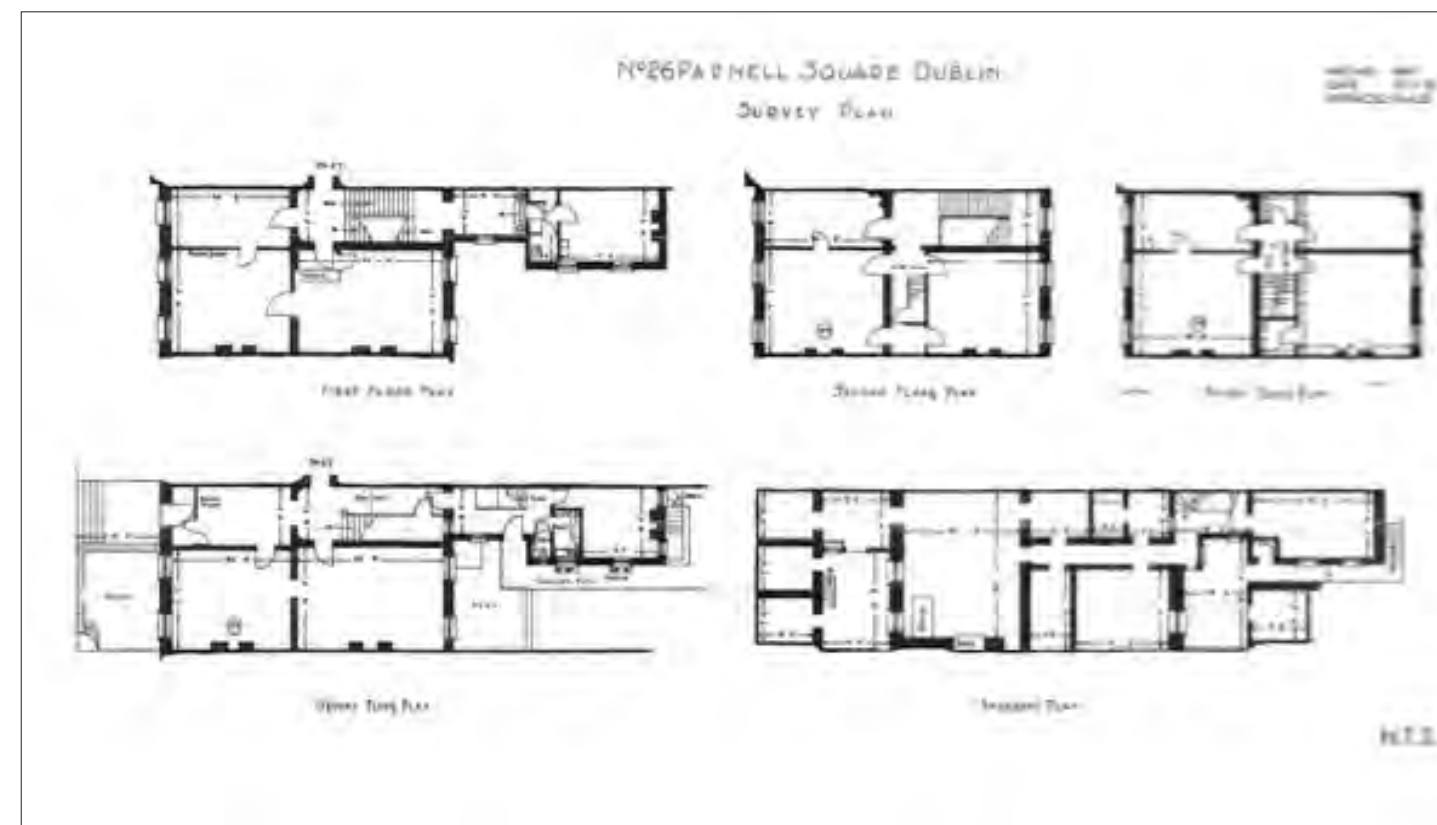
No 26: Plan form substantially intact. Interconnection with No 27 at ground and first floor. Note curved walls to first floor landing in stairhall. Small porch inside front door. Two-storey over basement return and open basement area to rear.
